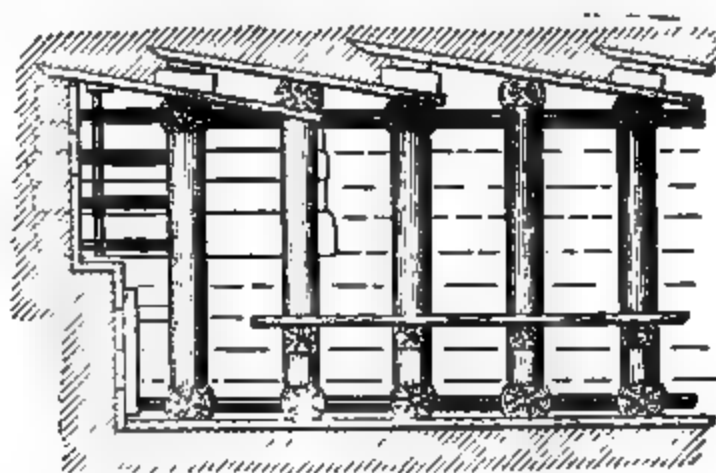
TIMBERING FOR TUNNEL HEADING.
